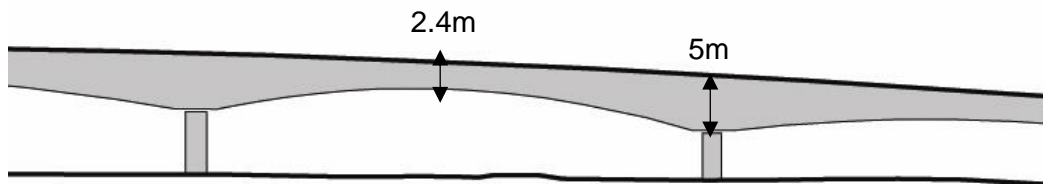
Indicative elevation of varying bridge deck thicknesses across spans
